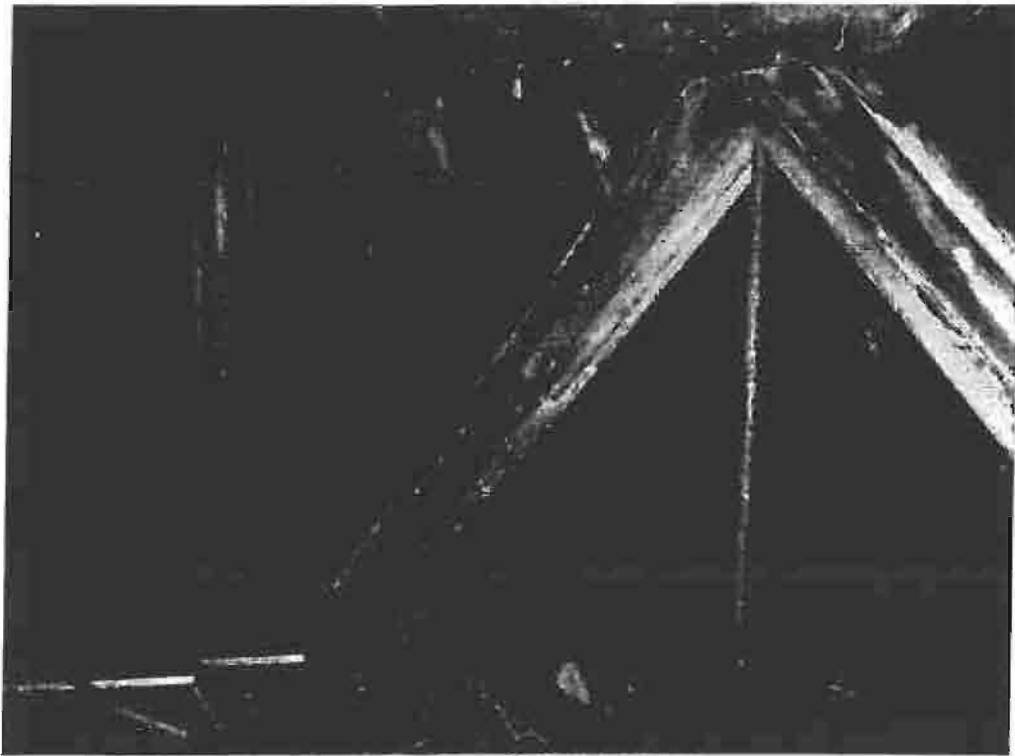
Timber Framing of Roof. (2014-05-23)
